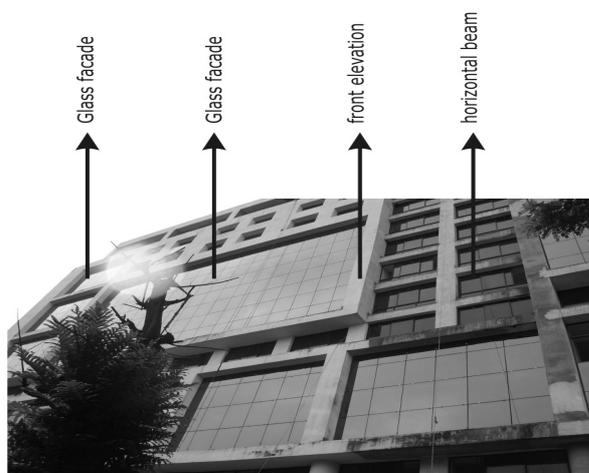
Front elevation of high rise building at Chittagong; CNF Tower
